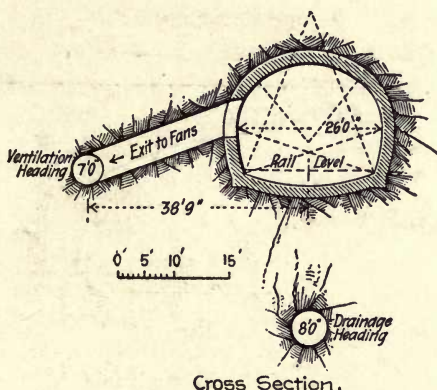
Mersey Tunnel: Showing Ventilating Conduit.
